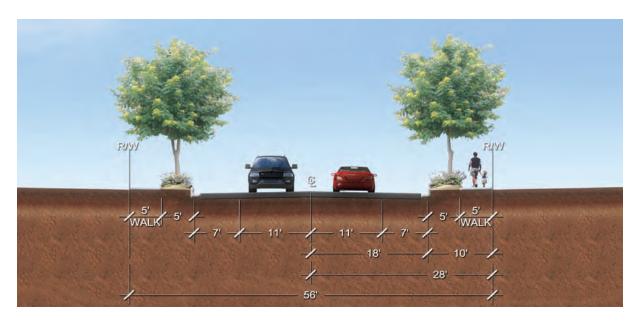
| Themed Road(s) - I Section (56' R.O.W.)
